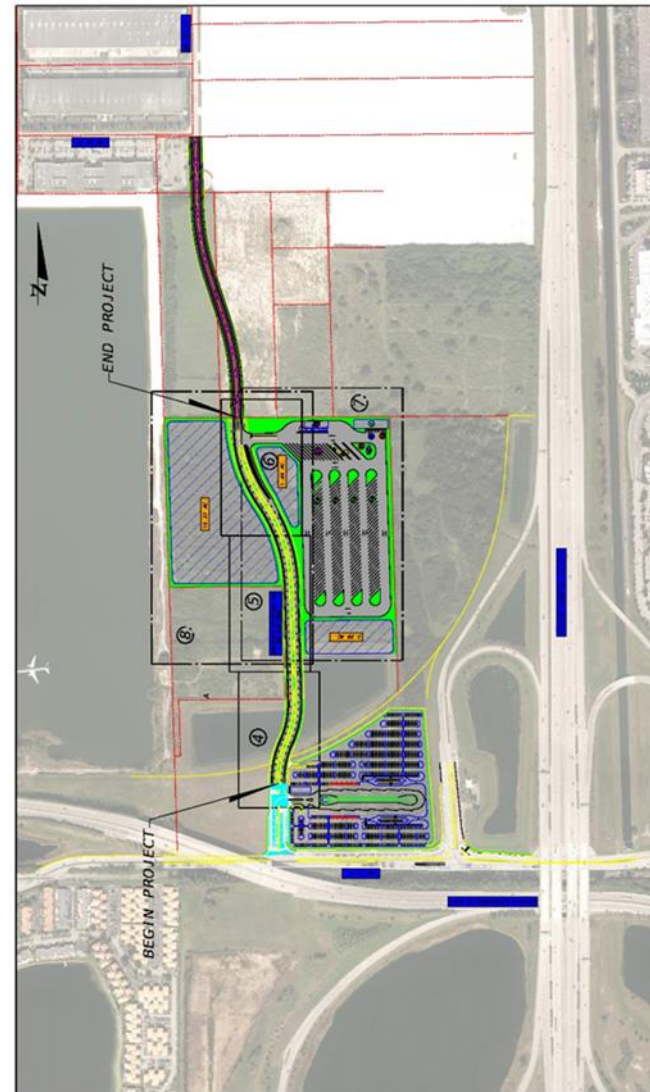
Dolphin Station Park-n-Ride and Transit Terminal and Truck Travel Center Recommended Layout
